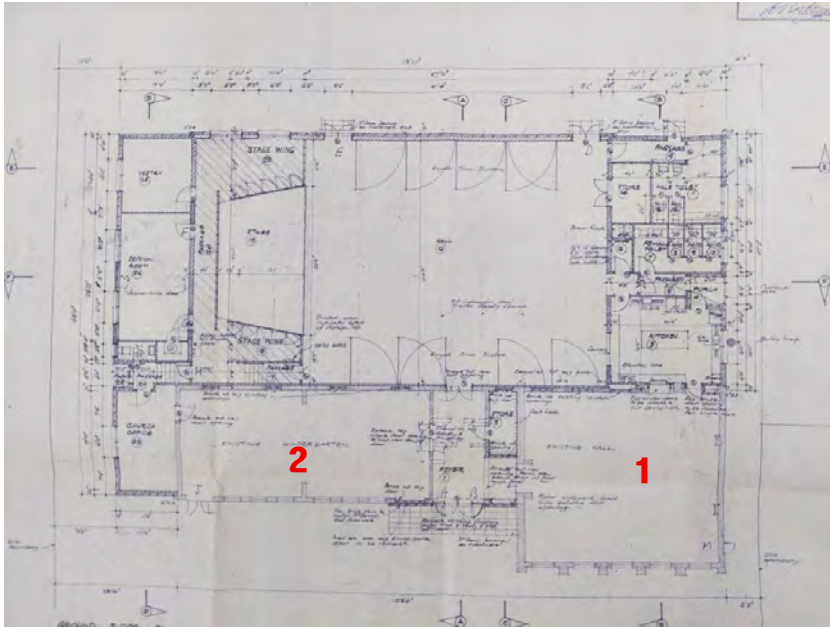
Plan dated 1966 showing the existing memorial hall ('1') and kindergarten hall ('2'), and the proposed hall and additions to the rear (south and west); additions comprised a hall with a stage, office, vestry, session room and facilities. Drawing by architects Perrott, Lyon, Timbrock & Kesa (Source: PROV, PB File)
